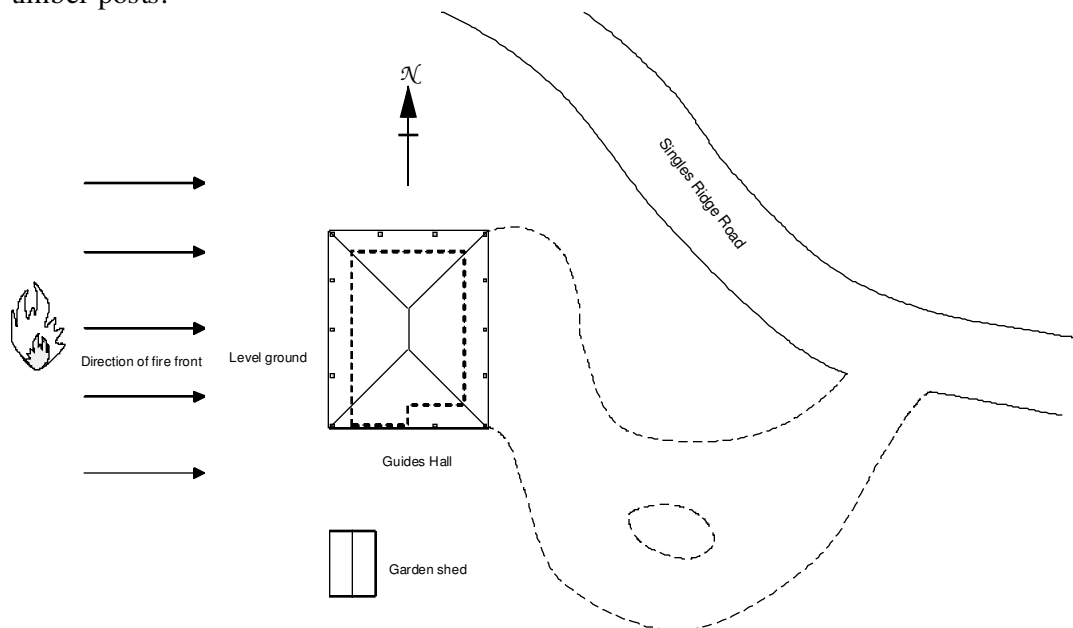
Guide's Hall building orientation off Singles Ridge Road.
